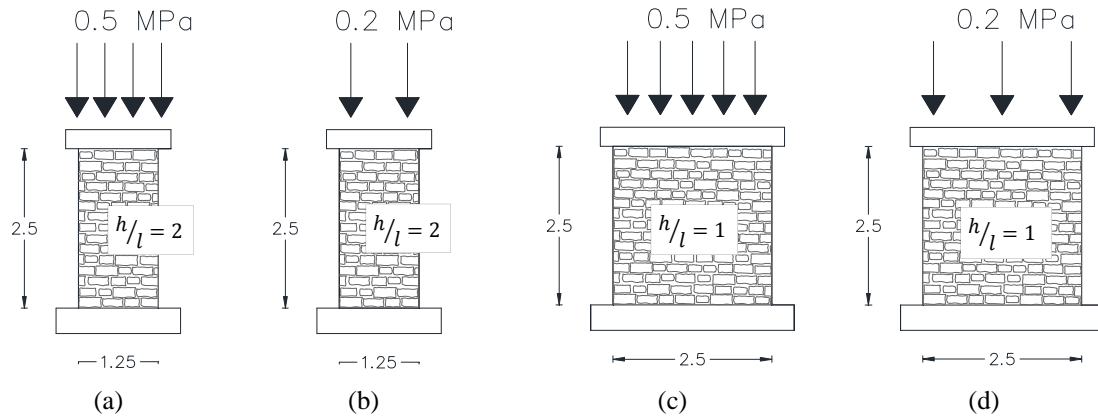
Wall specimens for in-plane cyclic tests: (a) CS01 wall; (b) CS02 wall; (c) CT01 wall; (d) CT02 wall (Magenes et al. 2010b).
